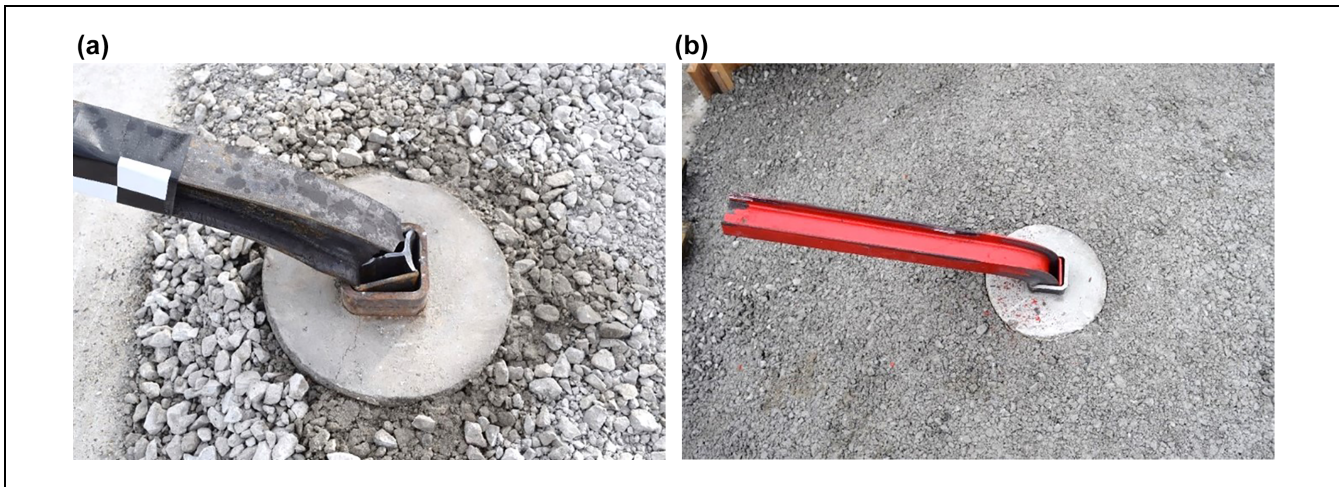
Post-test damage to cylindrical concrete foundations from: (a) lateral and (b) longitudinal impacts.
